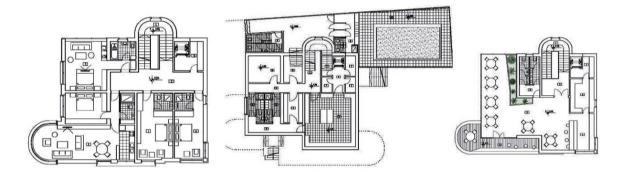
Villa Živković, new design proposal – first floor plan, basement) and attic.
